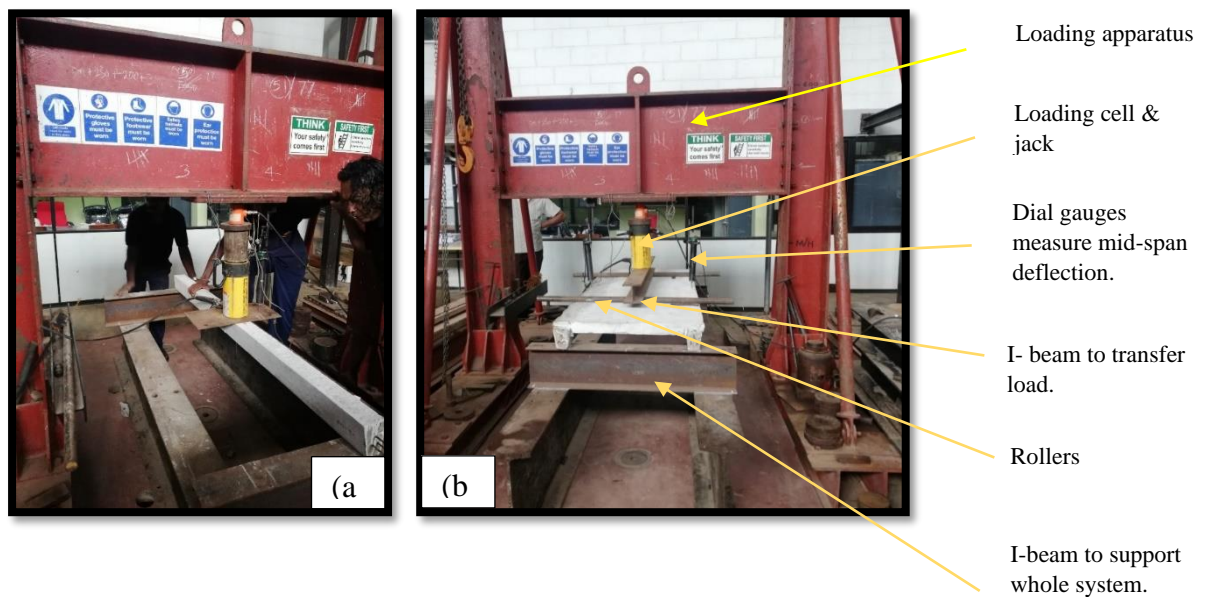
Test setup and instrumentation (a) loading setup of pre-stressed beam (b) loading setup of composite slab.
